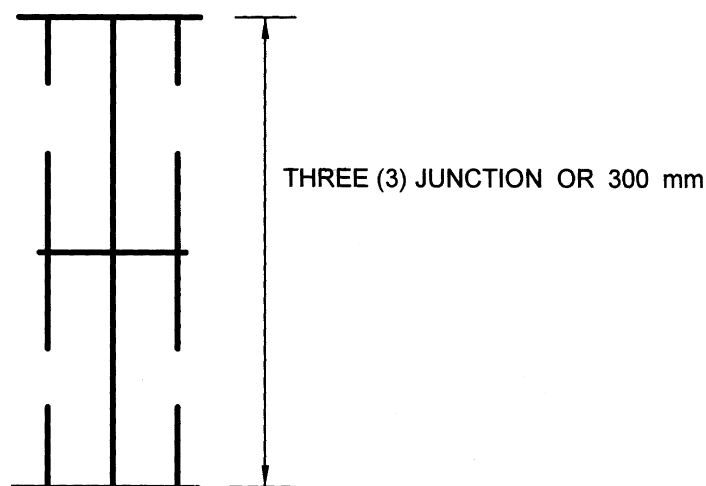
SPECIMEN DIMENSIONS FOR METHOD A
